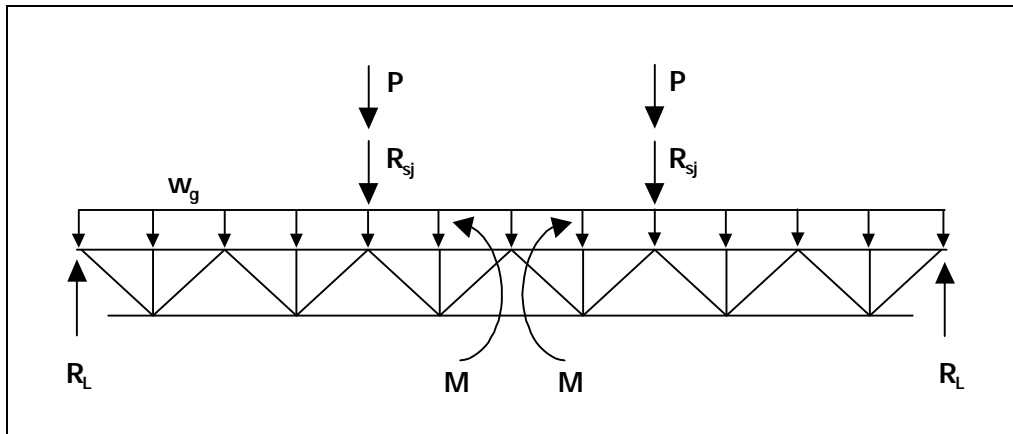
Force Diagram Representing Joist-Girder Loading
